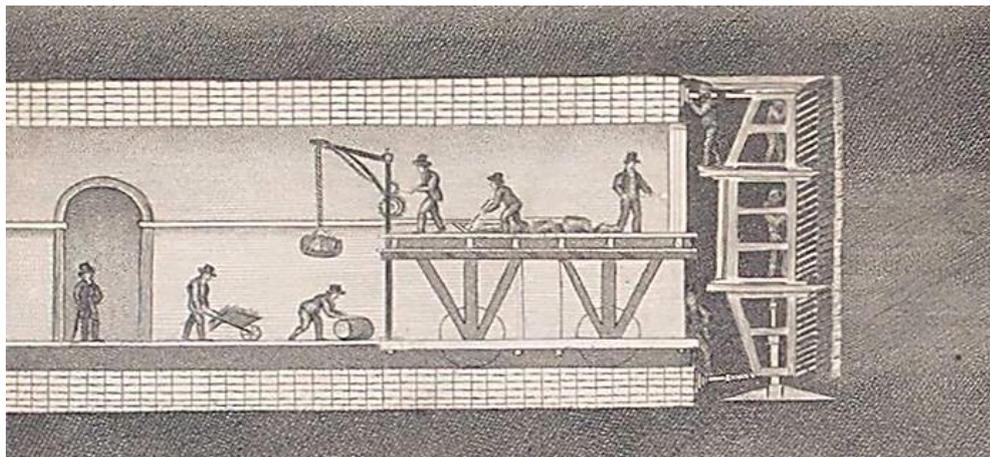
Longitudinal Section of the Thames Tunnel (Thames Tunnel Corporation, 1836; Credit: New York Public Library)
